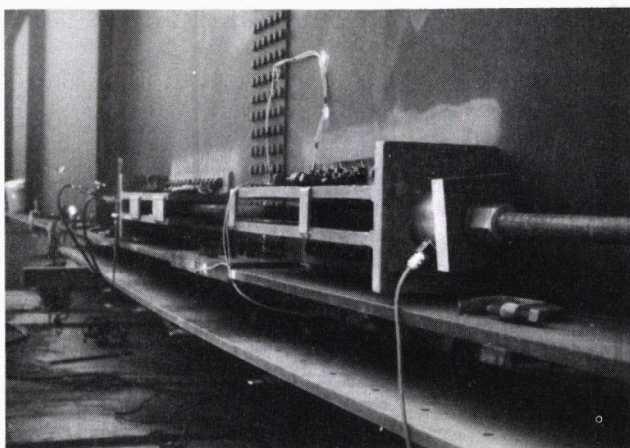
Post-tensioning assembly installed at girder bolted splice connection used to install coverplate retrofit.
